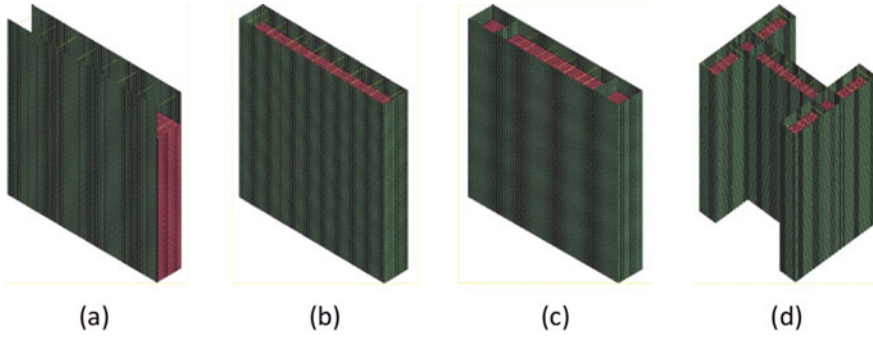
Four cross-section shapes: a Double skin plates SC wall (DS-SC wall), b Double skin plates with end plates SC wall (DSE-SC wall), c SC wall with boundary elements (BE-SC wall), d Flanged SC wall (FBE-SC wall)
